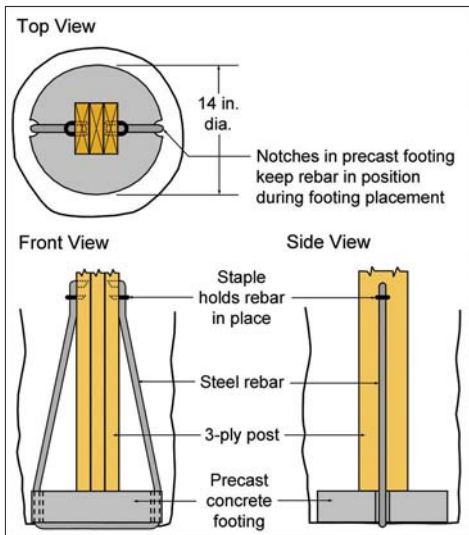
Post foundation featuring precast concrete footing. Uplift resistance is provided by steel rebar wrapped under the footing and attached to the post at location above grade. Proper insertion and fixing of rebar ends into post is critical to the design.
